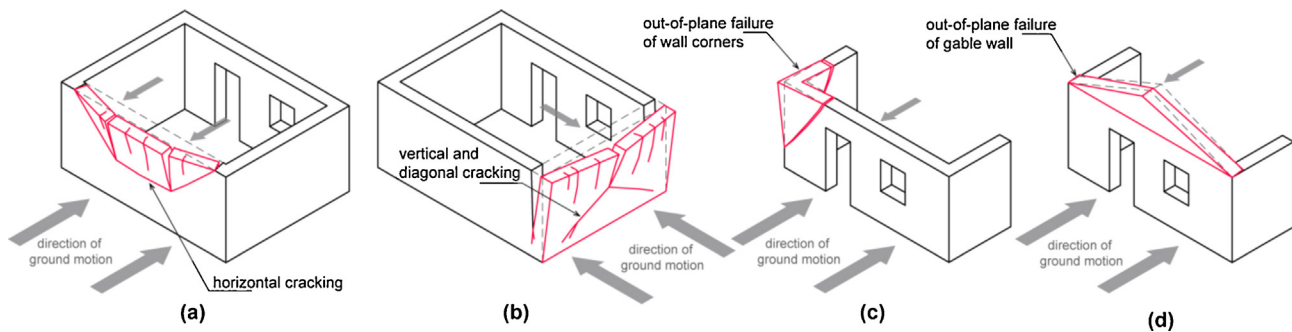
(a) Out-of-plane mechanism in long walls (adapted from [74]); (b) out-of-plane mechanism in short walls (adapted from [74]); (c) out-of-plane collapse of the corner; and (d) out-of-plane collapse of the gable.
